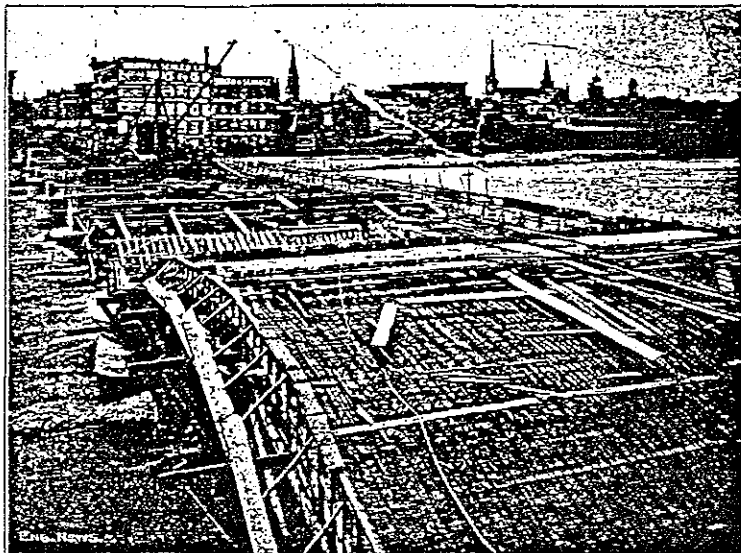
VIEW OF GRAND RAPIDS BRIDGE DURING CONSTRUCTION, SHOWING REINFORCEMENT IN PLACE ON CENTERS.
